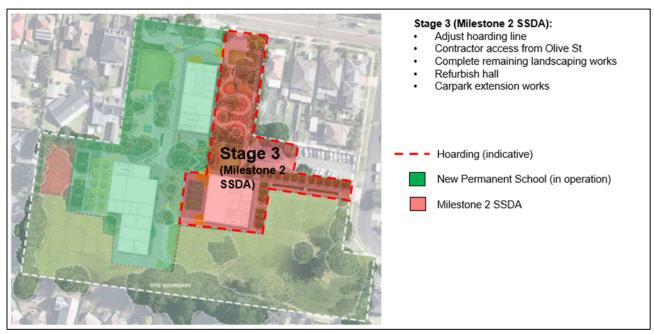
Milestone 2 SSDA Construction Site and adjacent School Operations
